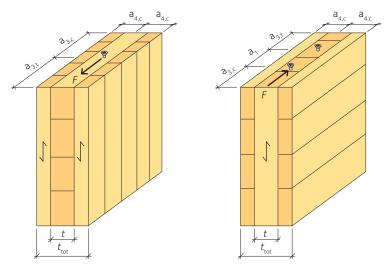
Minimum centre spacing and end/edge spacing for nails, wood screws and dowels in the CLT panel's edge.
